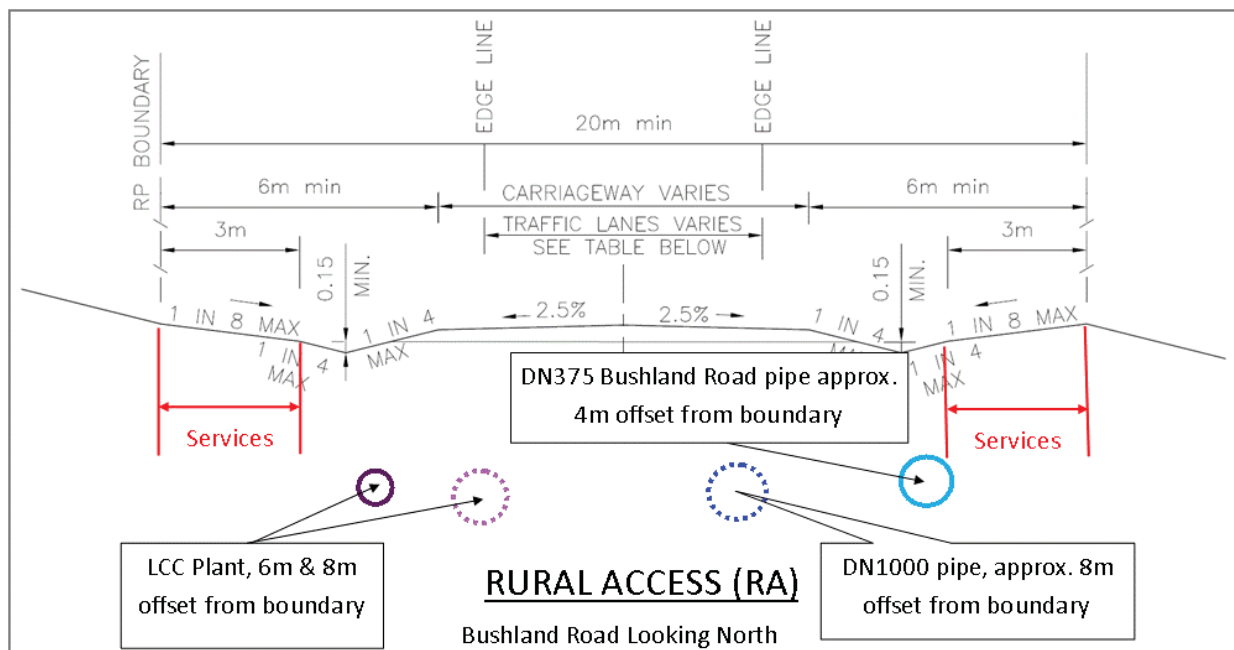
Proposed typical cross section based on Council's standard Rural Access cross section
